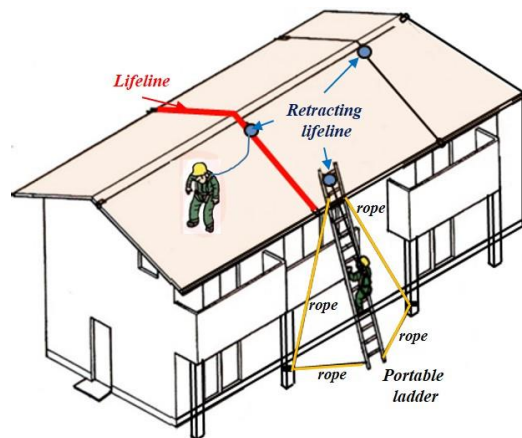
One of the countermeasures for residential roof work sites when temporary scaffolds with guardrails cannot be installed alongside roof edges.
